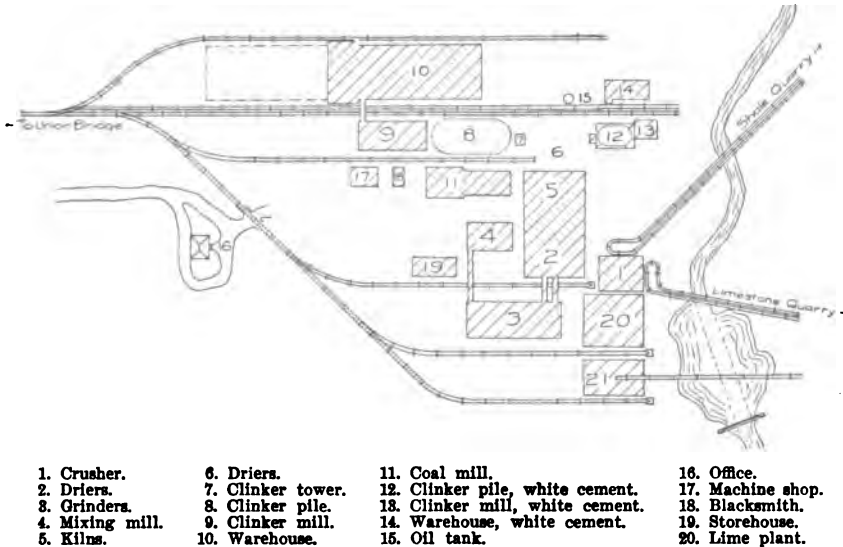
Plan of arrangement of buildings, Tidewater Portland Cement Company, Union Bridge.
